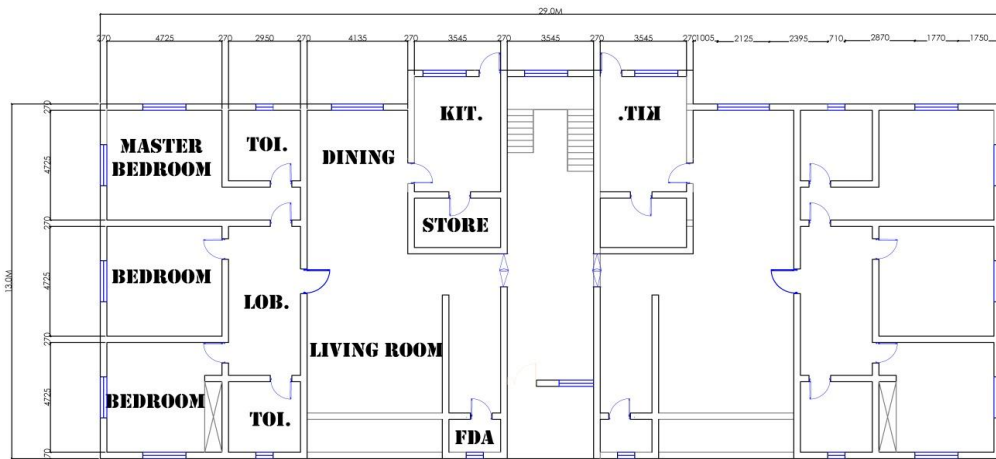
Location/Layout Plan, Ojokoro II Housing Scheme Blocks A-J
